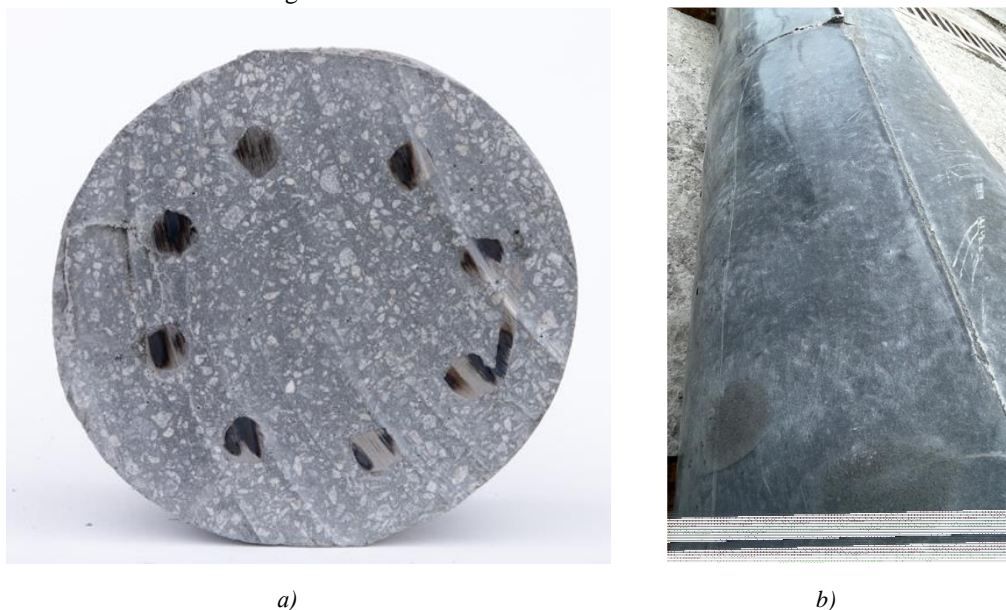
Concrete compaction quality: *a* — reinforced concrete core in section; *b* — lateral surface of the reinforced concrete core
